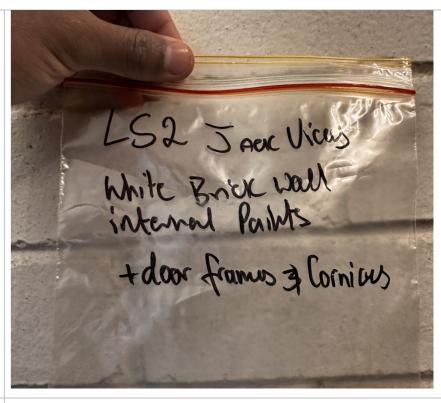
RVB - Sample 2 (S2): White brick wall, internal paint
